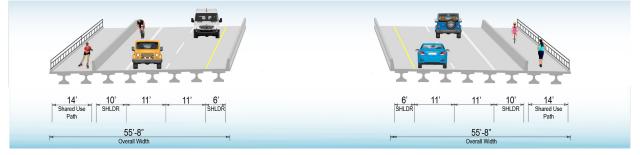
SR 789 Proposed Single Bridge Typical Section
